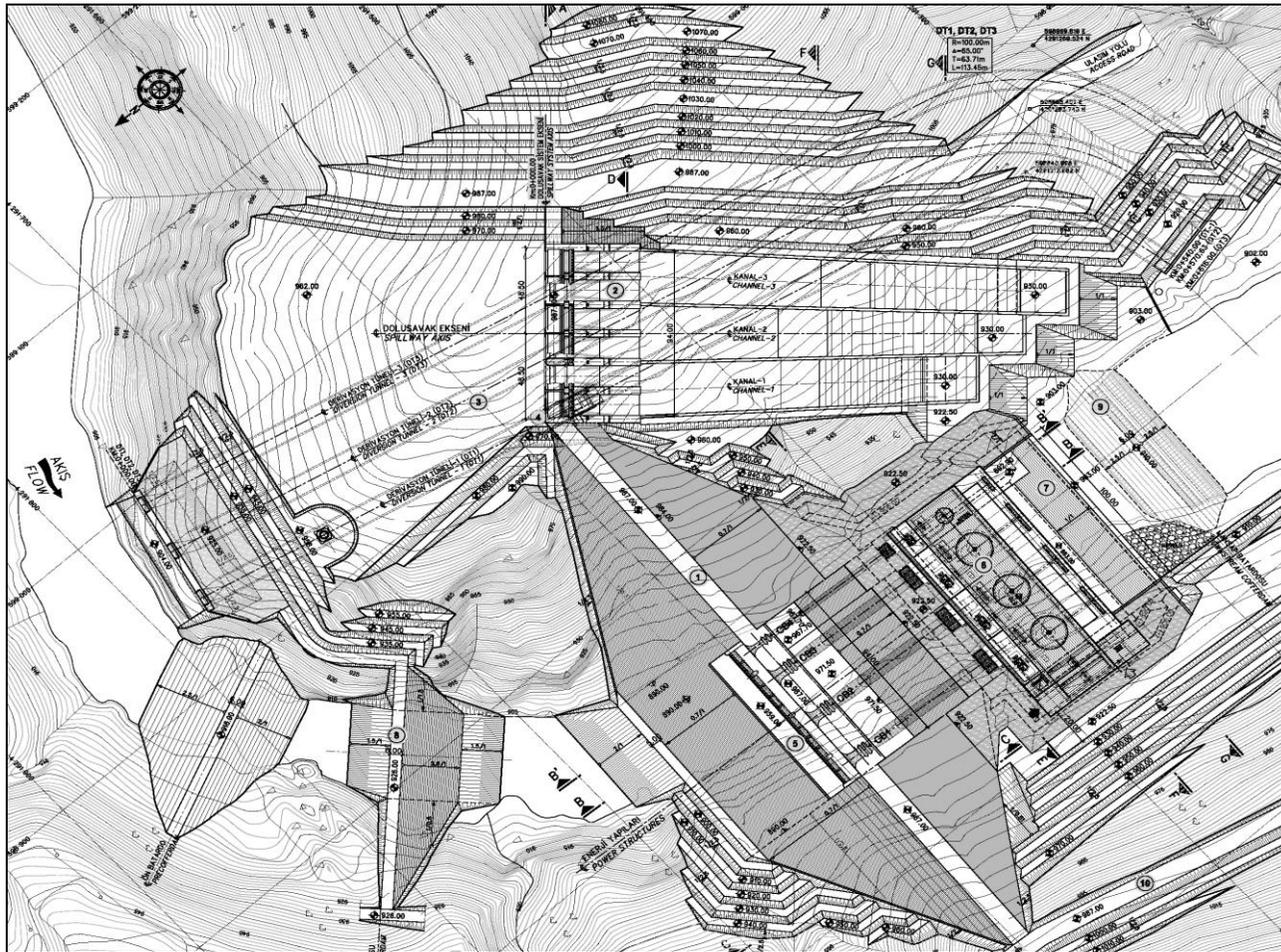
General plan of Beyhan 1 Dam and HEPP (Temelsu International Engineering Services Inc., 2011)
